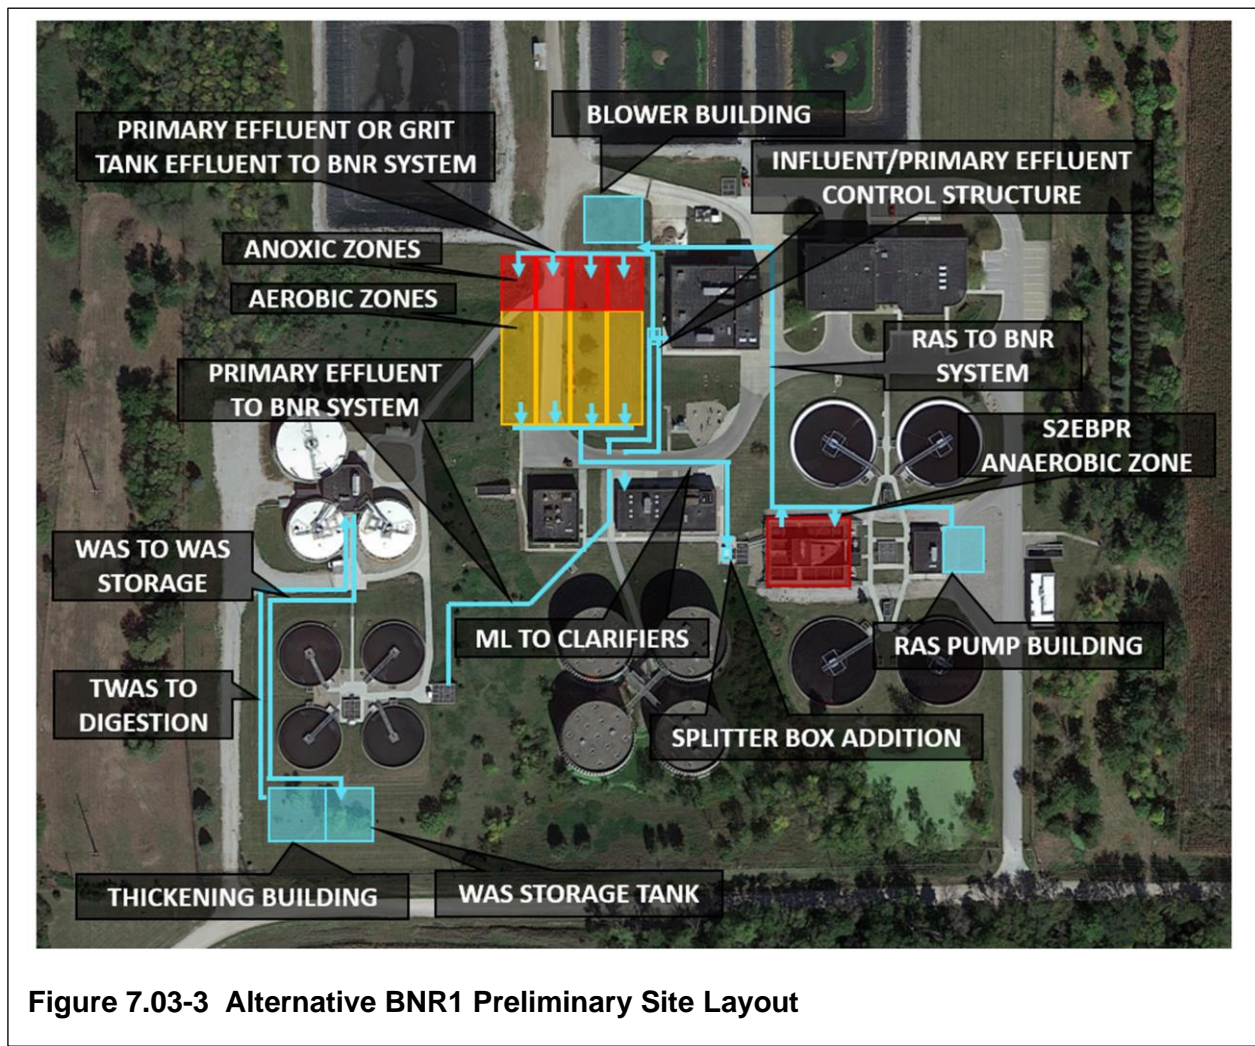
Alternative BNR1 Preliminary Site Layout
